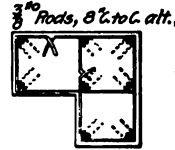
Corner Column, Twelve-Story Loft Building.
